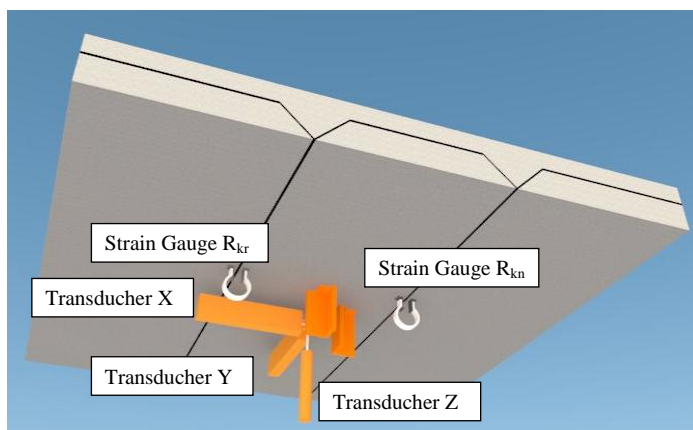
Transducer / LVDT position in half slab precast with triangular connection
